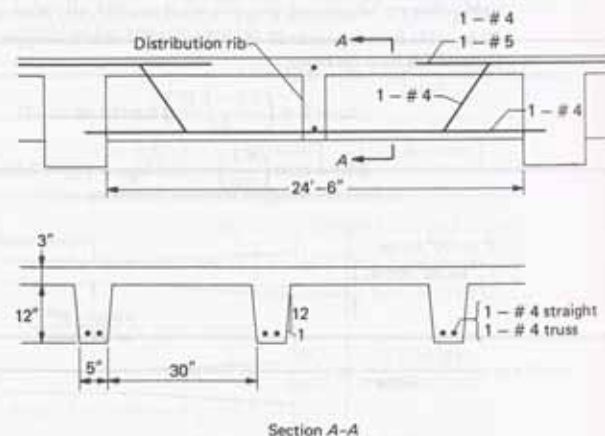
Concrete joist floor using removable pans, Example 10.11.1.
